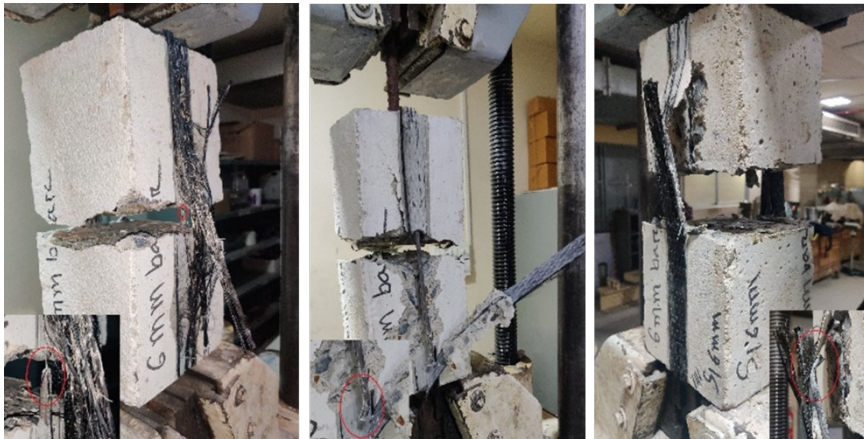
Failure modes of prism specimen with embedded bar anchor.
